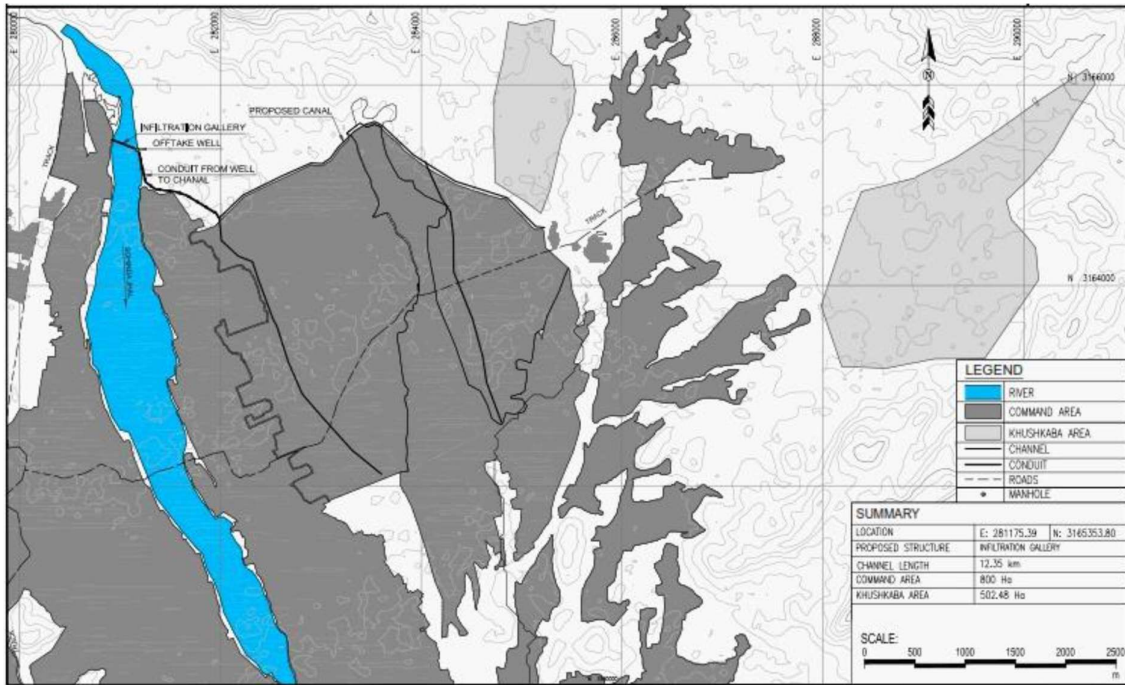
Layout Plan of Proposed Churri Infiltration Gallery
